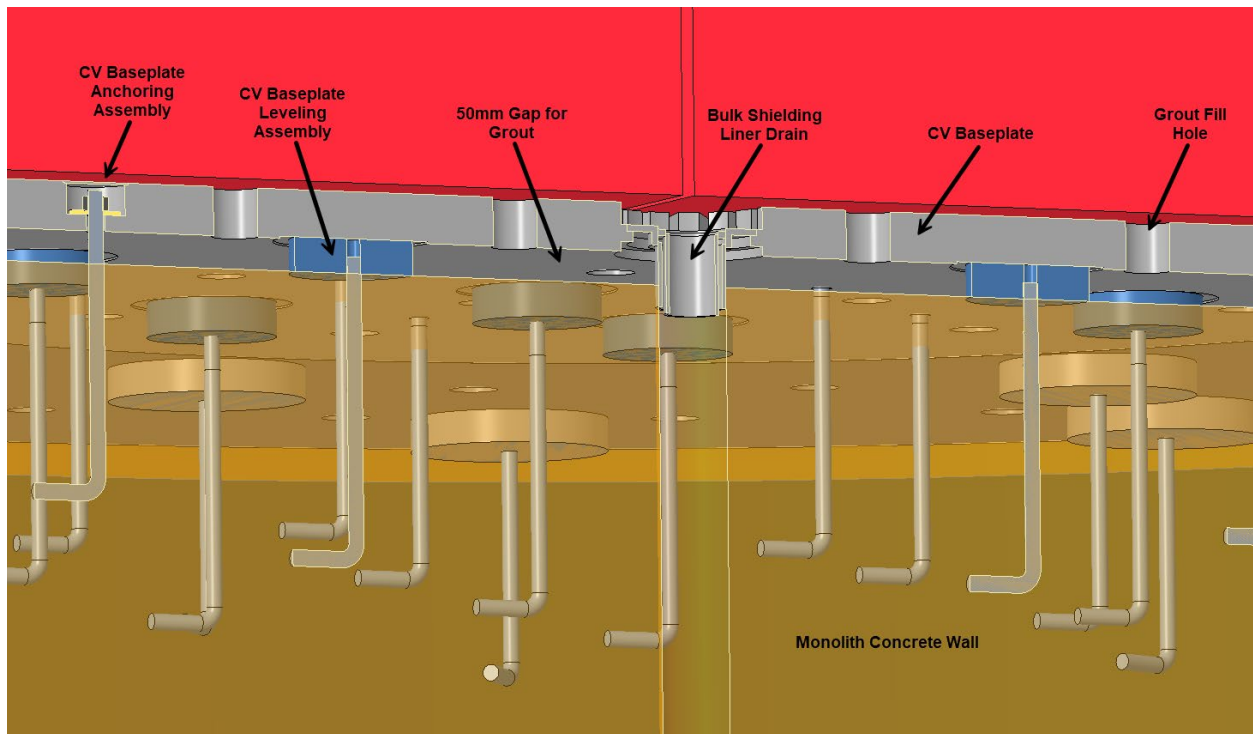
Cross sectional view showing Core Vessel Baseplate to monolith concrete floor interface. Note: anchor geometry is notional and will be determined by CF team.
